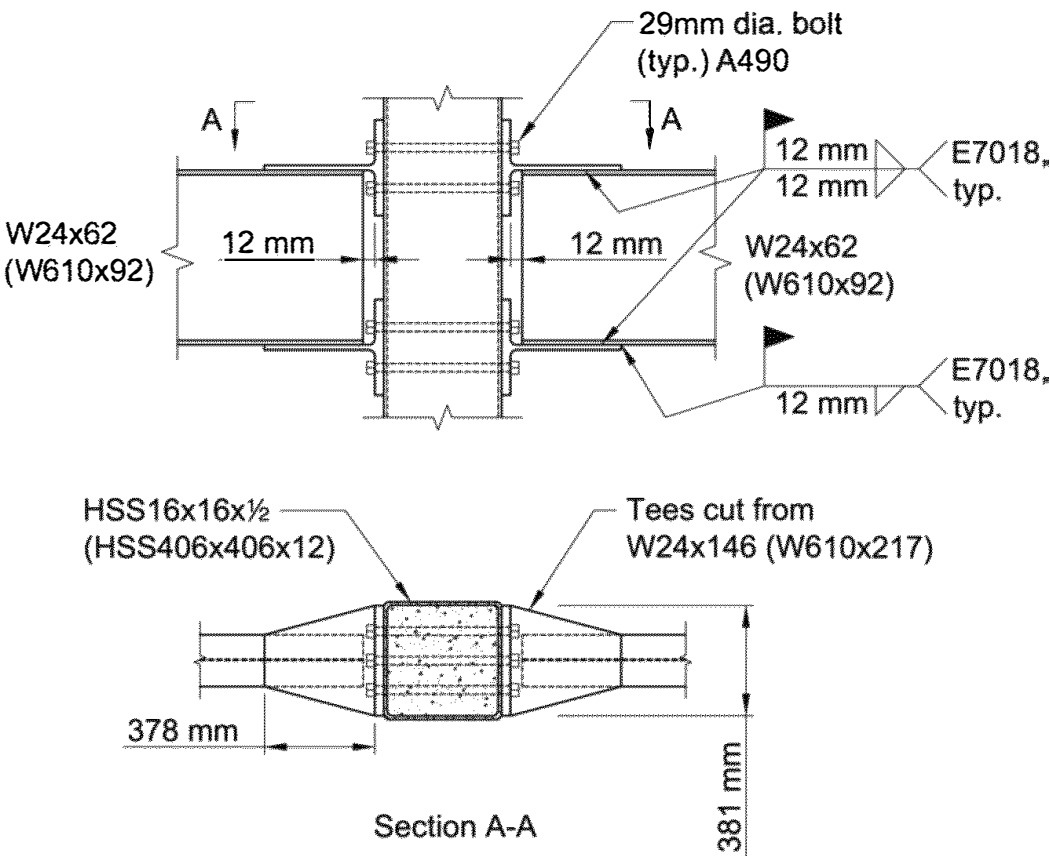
Filled composite column-to-steel beam moment connection (beam flange interrupted).
